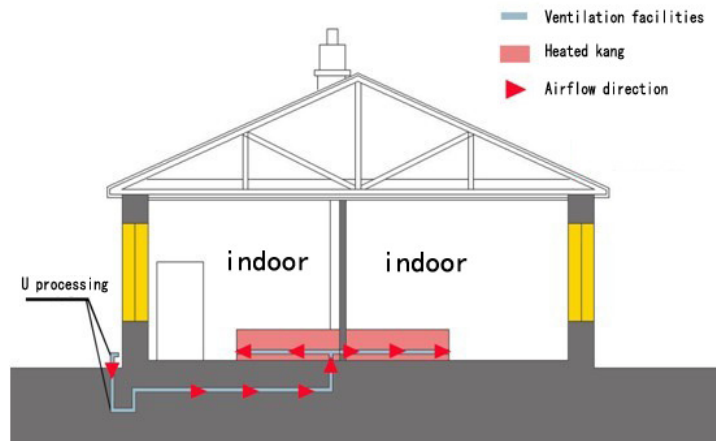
Typical Residential Ventilation Facilities u-shaped Ventilation Pipe Design.
